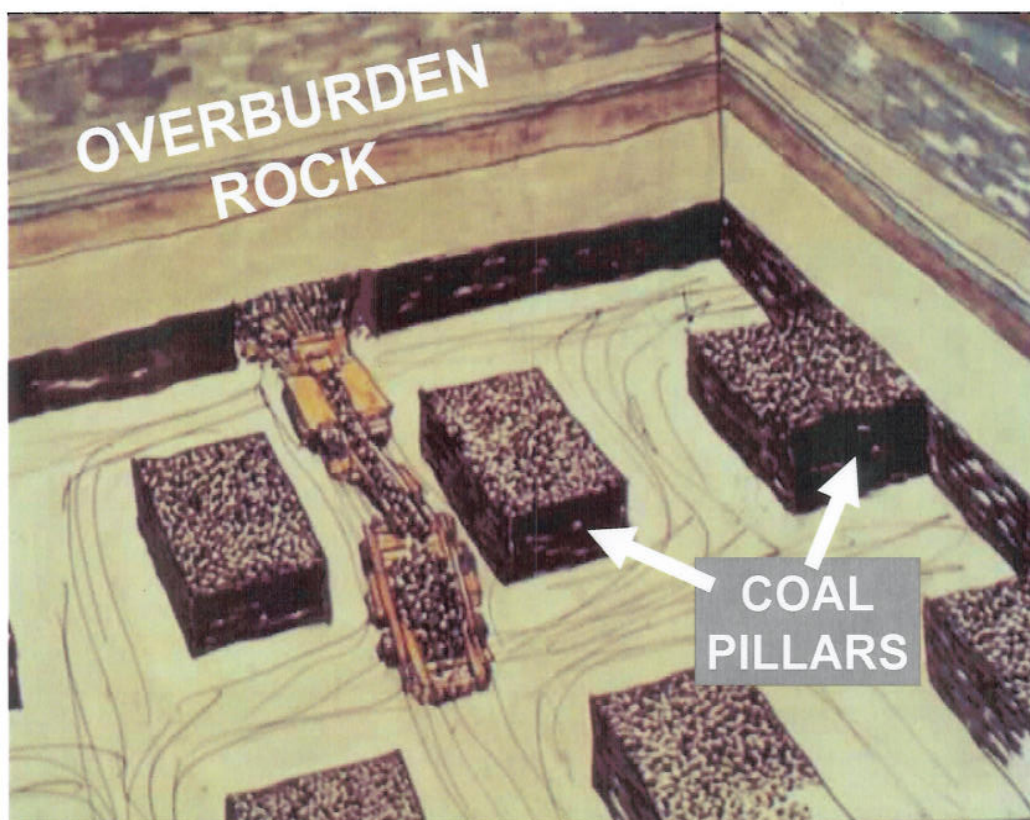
Coal pillars support the great weight of the overburden and provide “Global Stability.”
